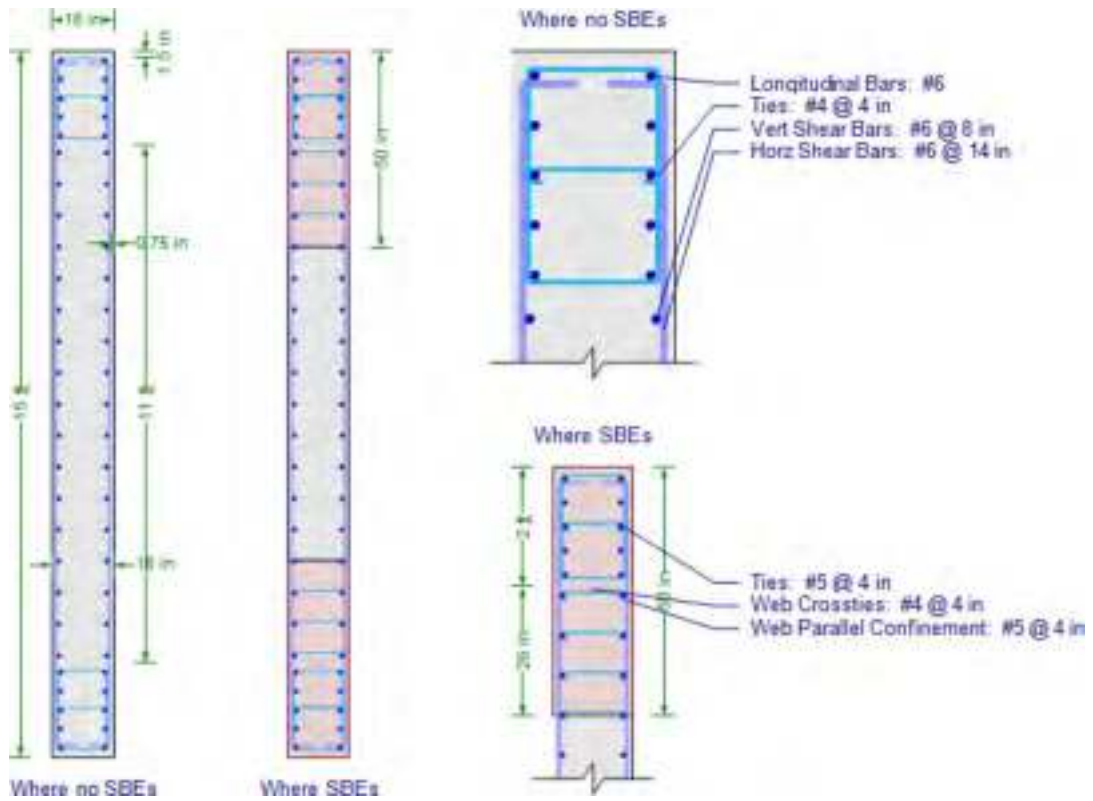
Sample Special RC Shear wall Reinforcement Details for 12-Story Buildings (B11-12S-L-S); Wall Section for Floors 1-3
